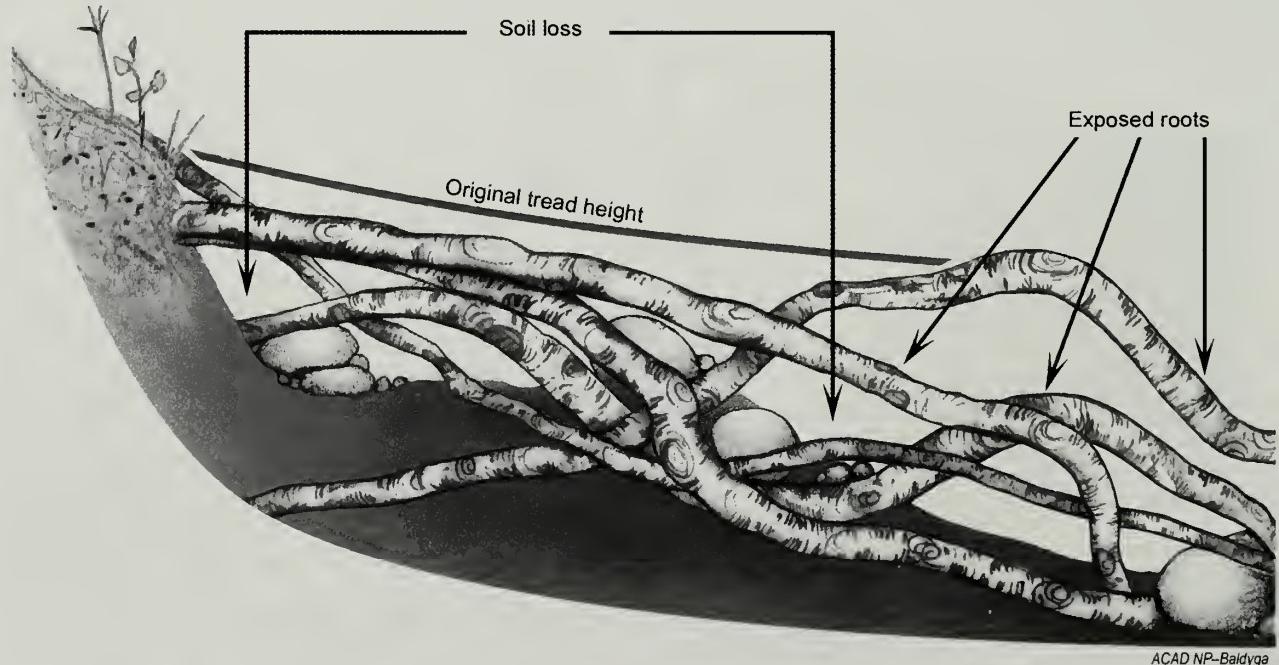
Detail of heavily rooted area before application of crush wall construction technique.
